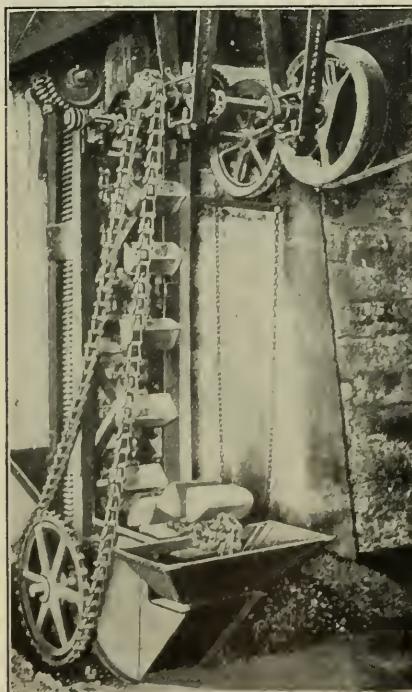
TELESCOPIC SIDEWALK ASH ELEVATOR LOWERED
